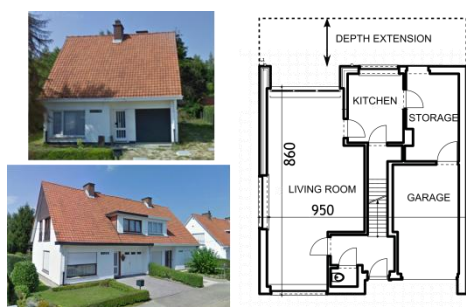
Casestudy dwelling (open and semi-terraced) and floor plan of ground floor (dimensions in mm).
